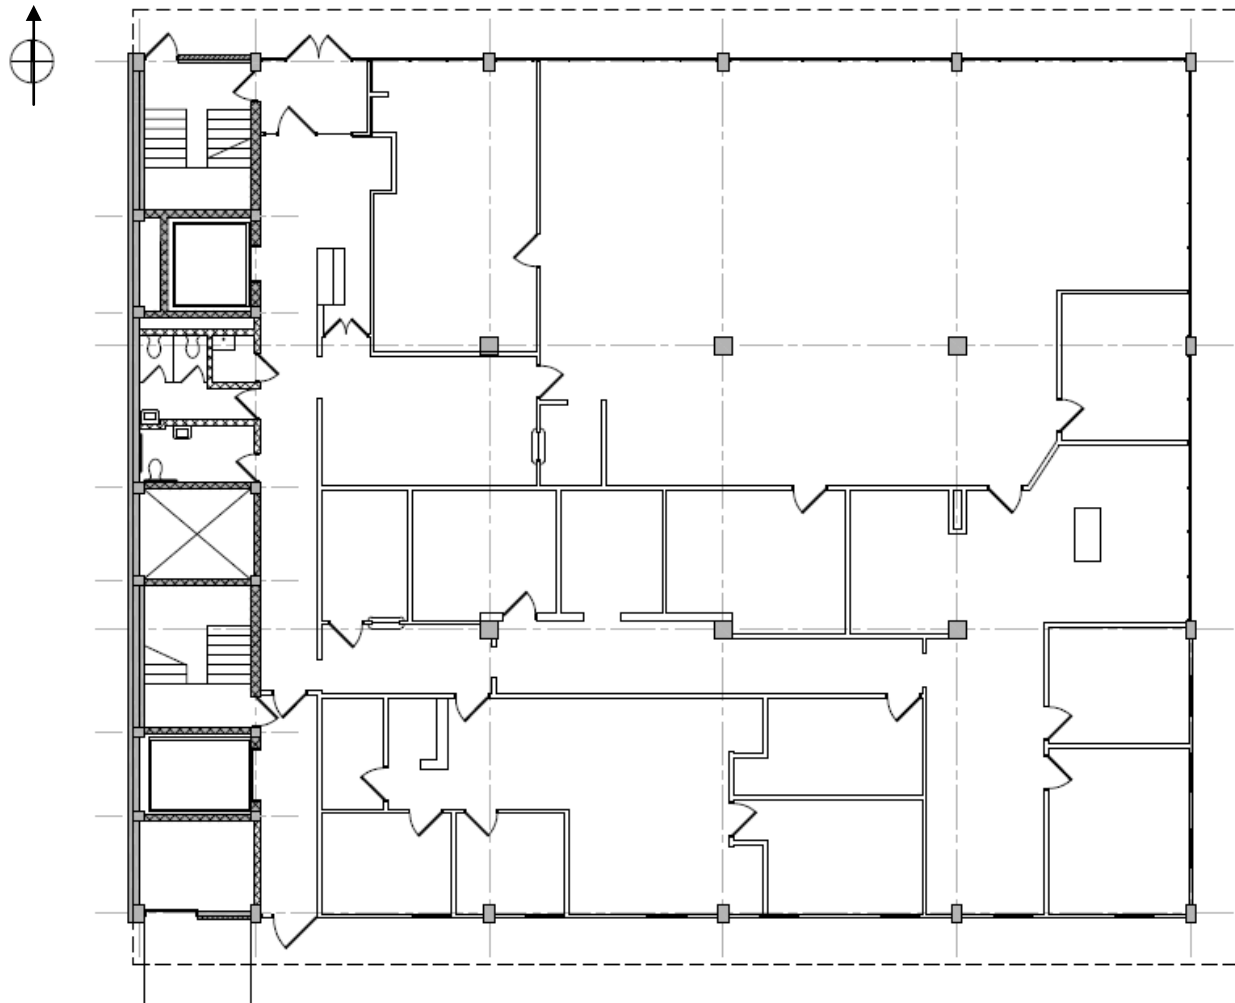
Current 1st floor plan. Source: The Lawrence Group Architects. Arrow indicates North.
